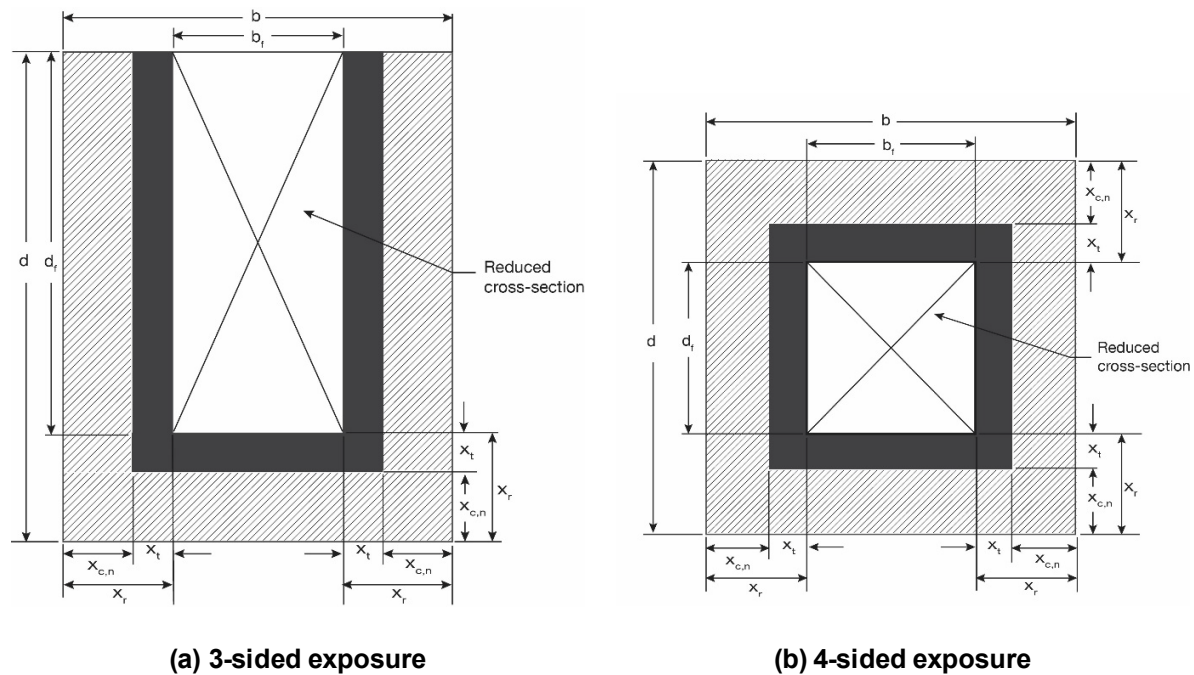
Charred timber cross-section exposed to fire from three sides (a) and four sides (b), as presented in CWC (2017).
